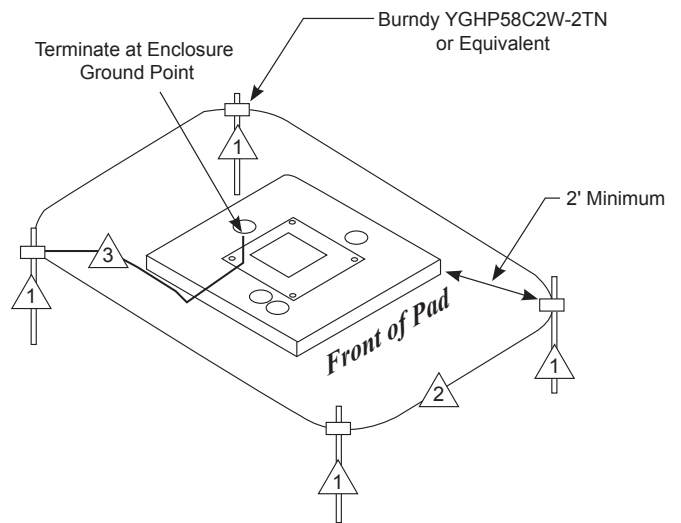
, Lightning Protection Ground Ring (Recommended Installation)
